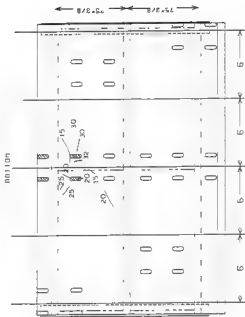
Bottom Cracking Pattern (Second Bridge - Test No 2)
